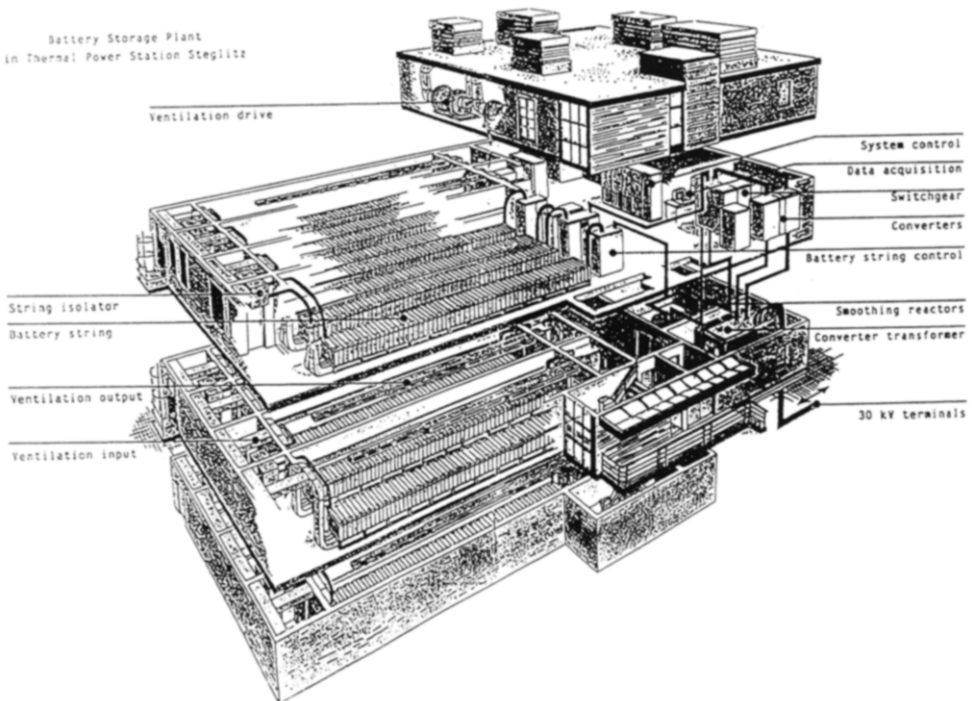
Layout arrangement of BSP at BEWAG, West Berlin.
